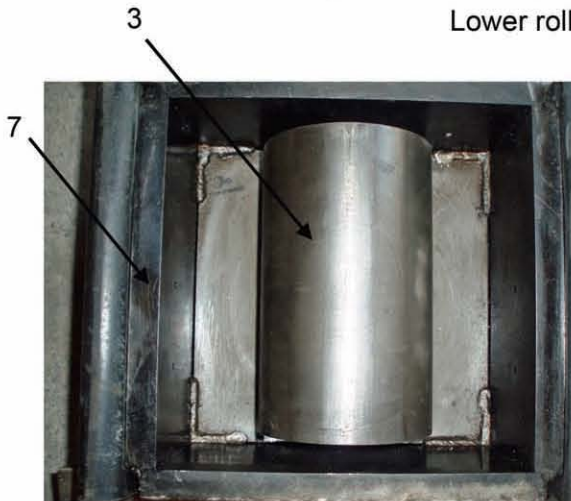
Design details of the second prototype roller bearing (cont'd)
